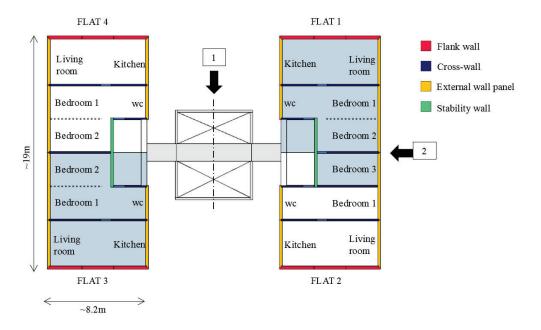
Approximate floorplan of each block. For illustrative purposes a one and three bedroom flat layout is shown on the same floor as a two bedroom flat layout.
